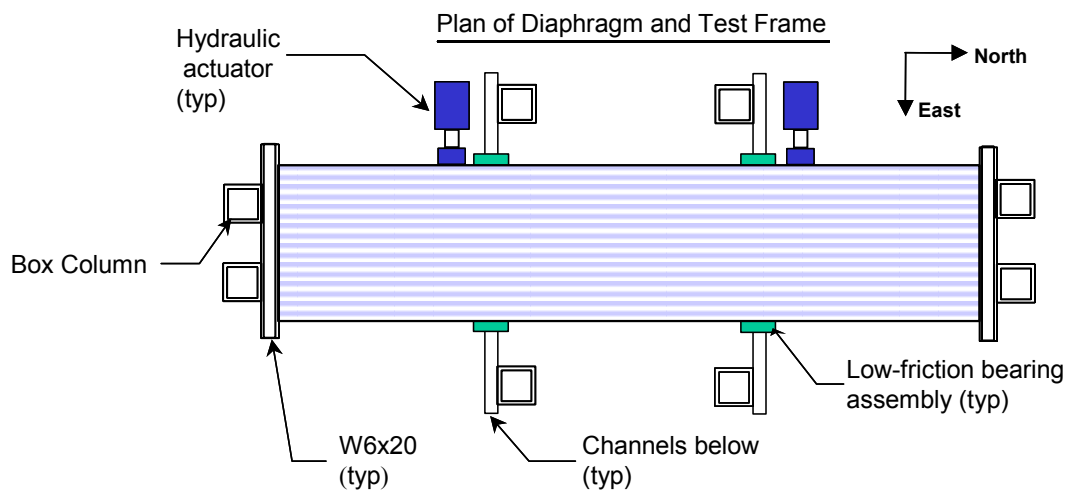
Plan drawing of test setup (Diaphragm #2)
